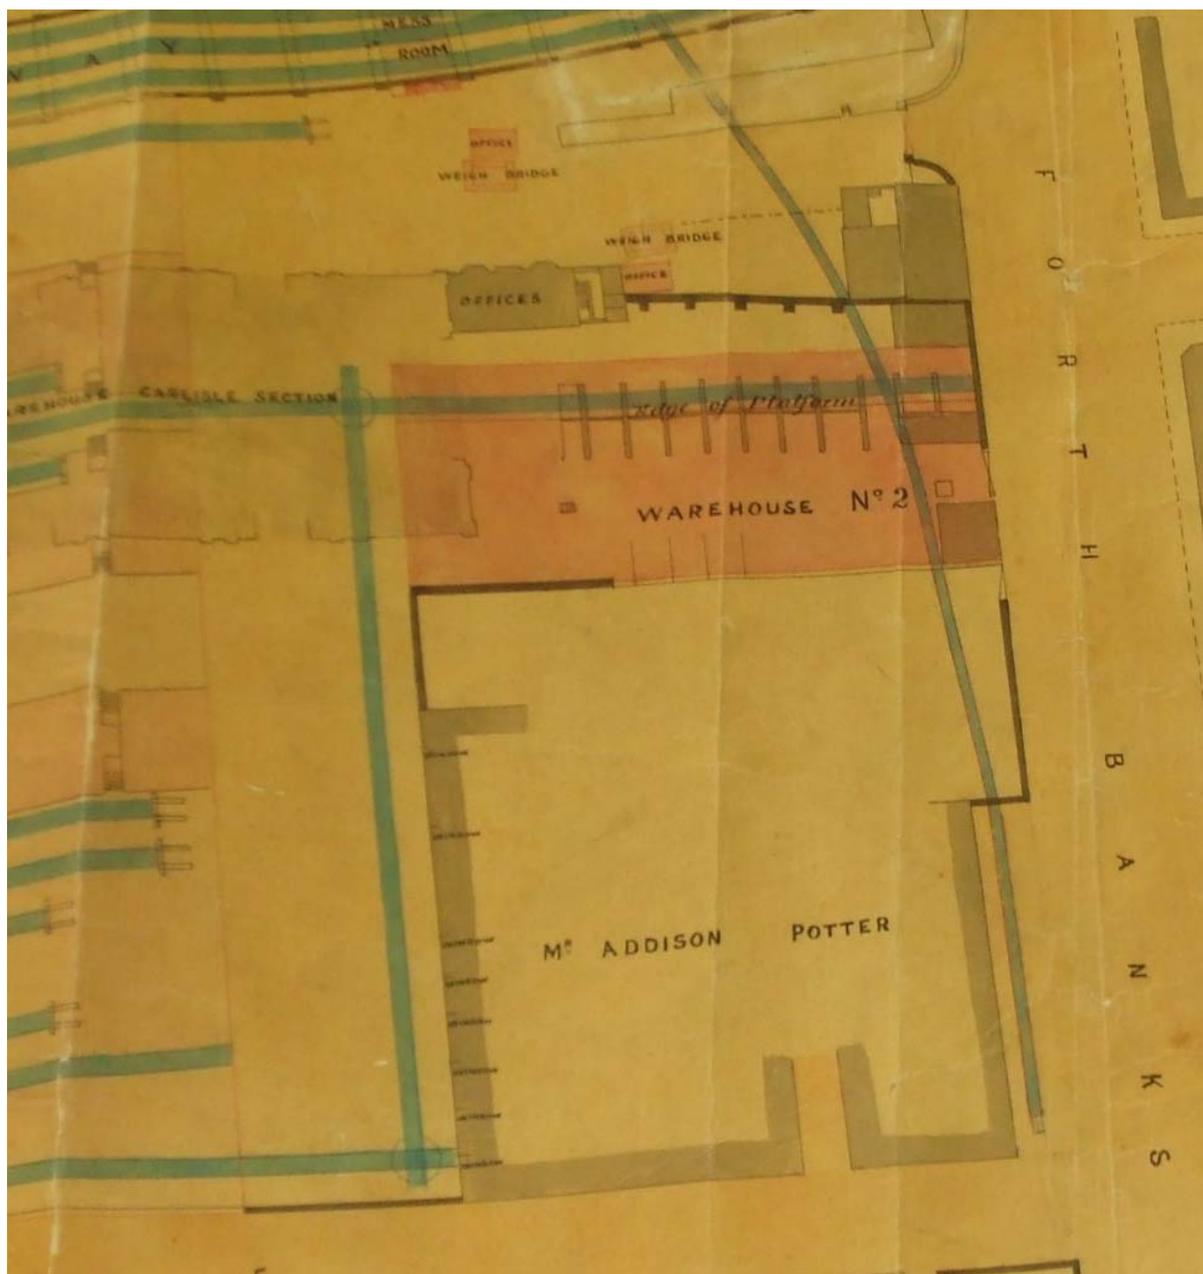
North Eastern Railway building control plan of 1866, indicating the second warehouse to be constructed to the north of the brewery, which is marked as belonging to Mr. Addison Potter. The office accommodation and superintendents house associated with the former goods shed are to be retained.
